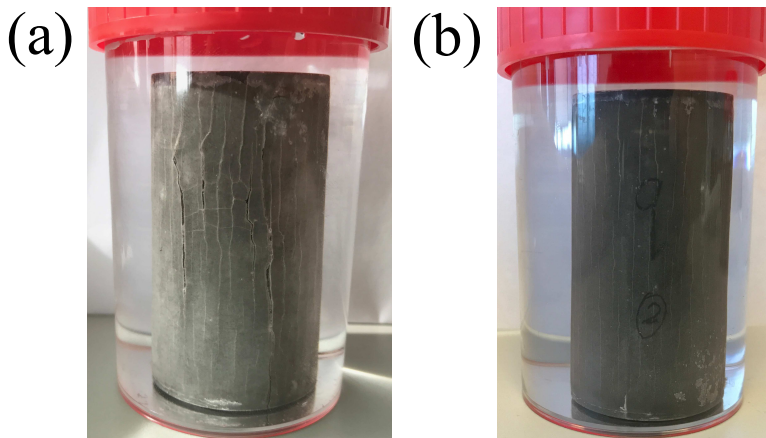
Restrained specimens immersed in 30 g/L SO_4^{2-} . (a) 581-day immersion under high-restraint condition (7 mm) (specimen 3) and (b) 765-day immersion under low-restraint condition (3 mm) (specimen 4).
